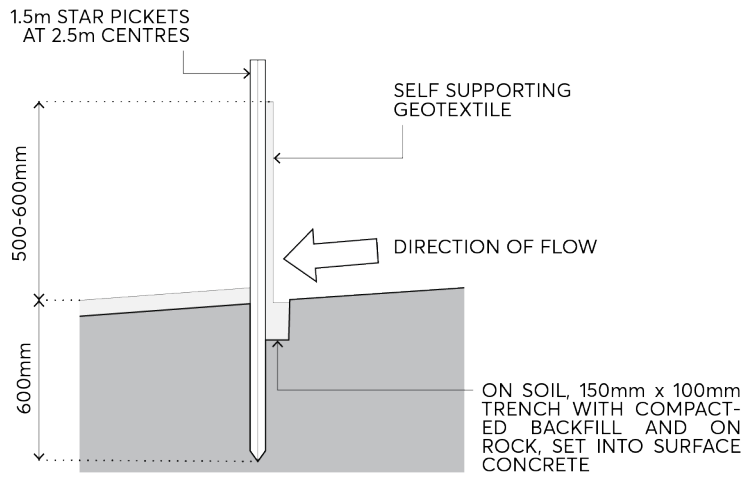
Section – Sedimentation Fencing (Source: Soils and Construction: Managing Urban Stormwater, Landcom, March 2004)
